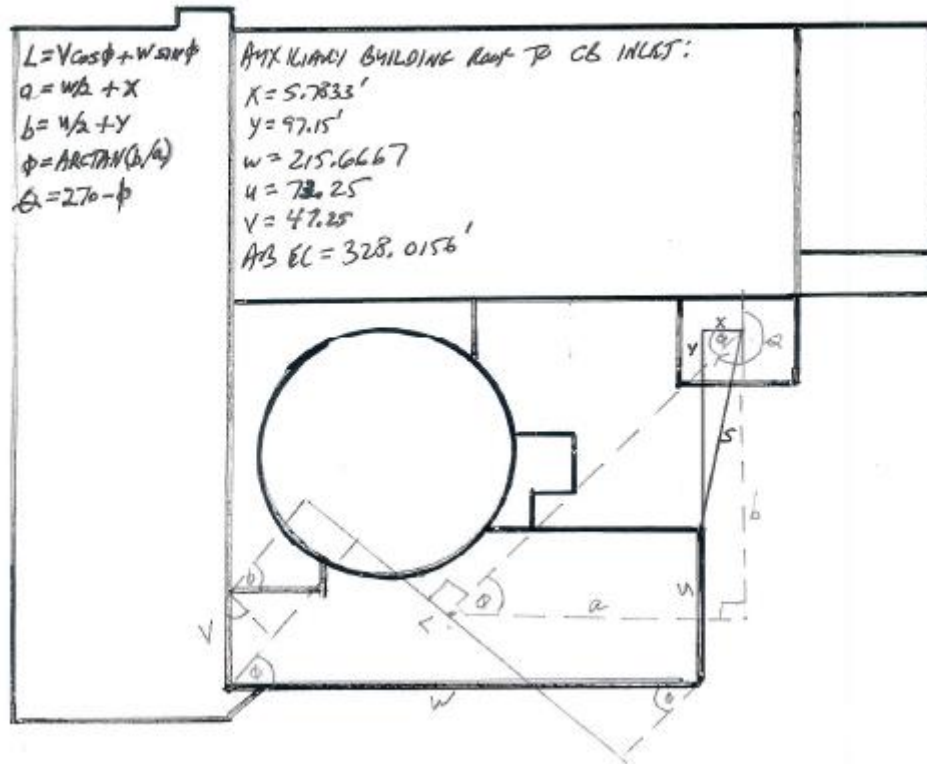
Auxiliary Building Roof (Area Source) to Control Room Inlet
